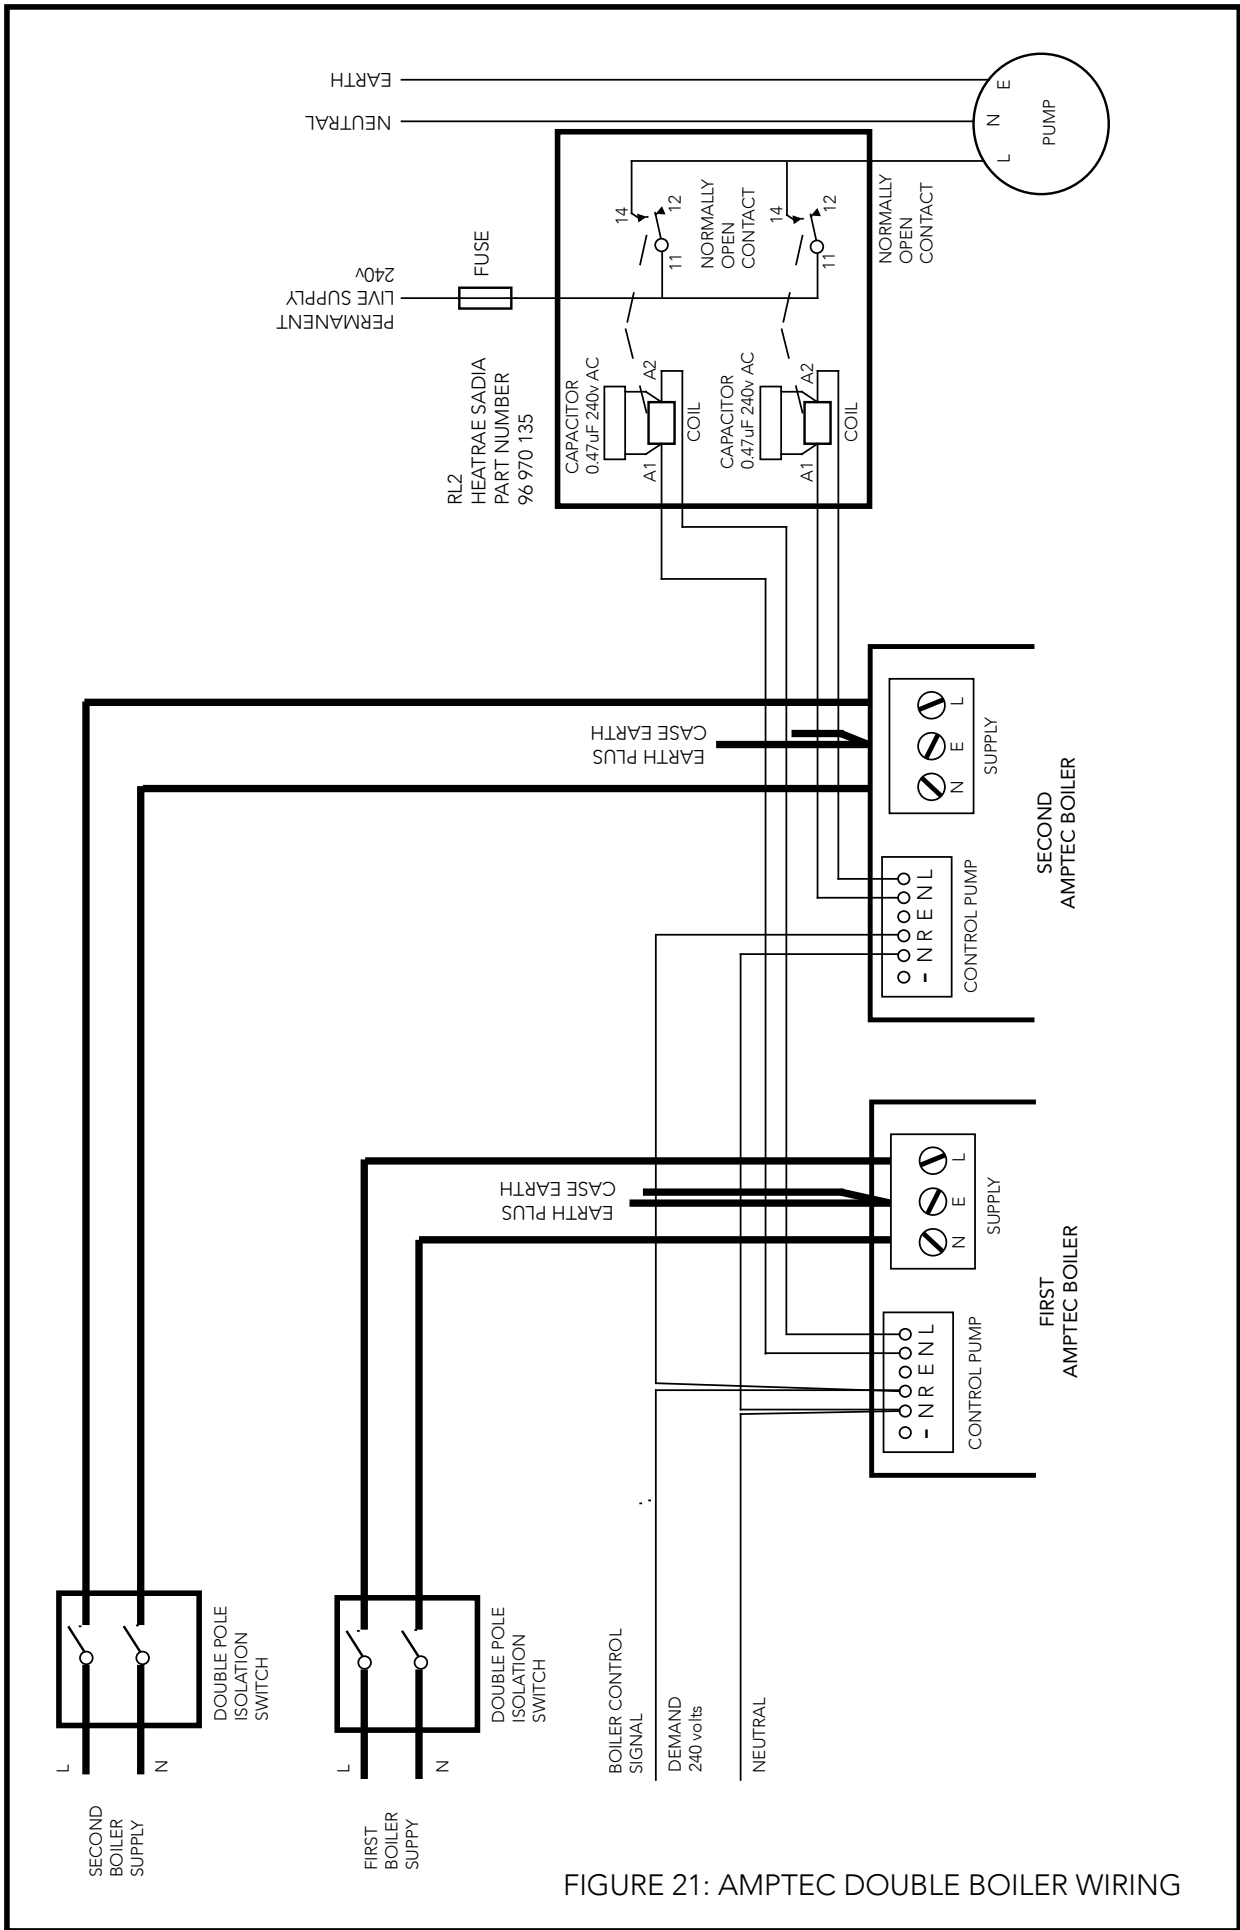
AMPTEC DOUBLE BOILER WIRING
